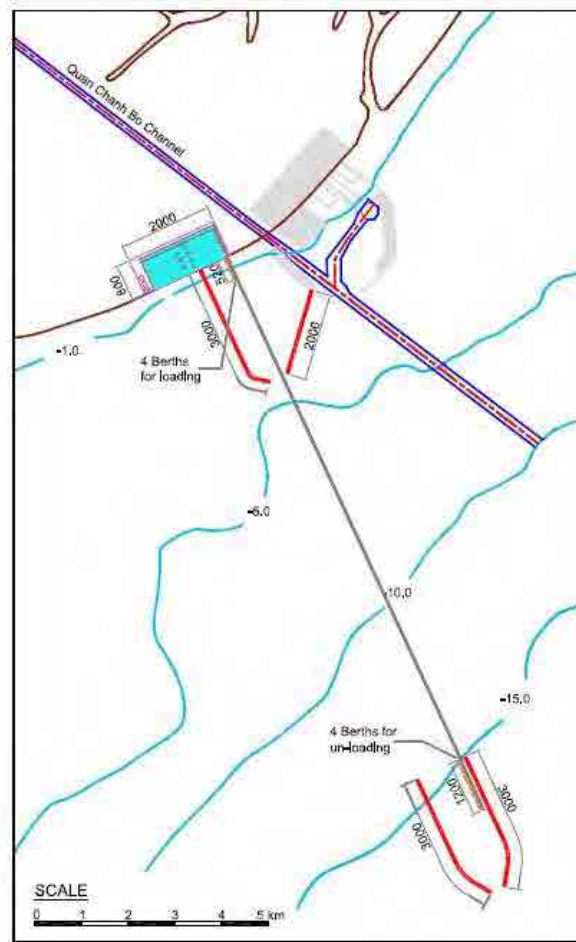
Layout of Fixed Type Imported Coal Transshipment Terminal in Tra Vinh (with Trestle)
